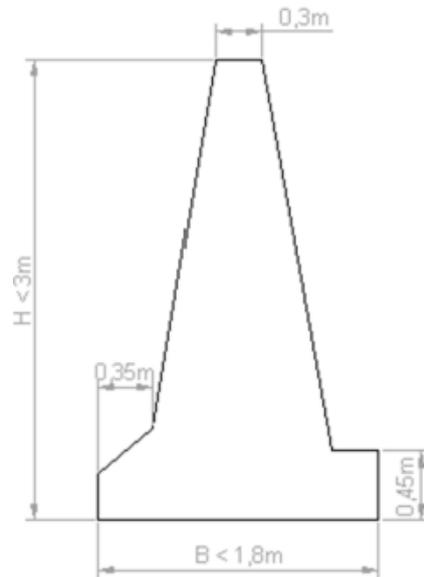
Mortar rock wall (heights of up to 3.0 m).
